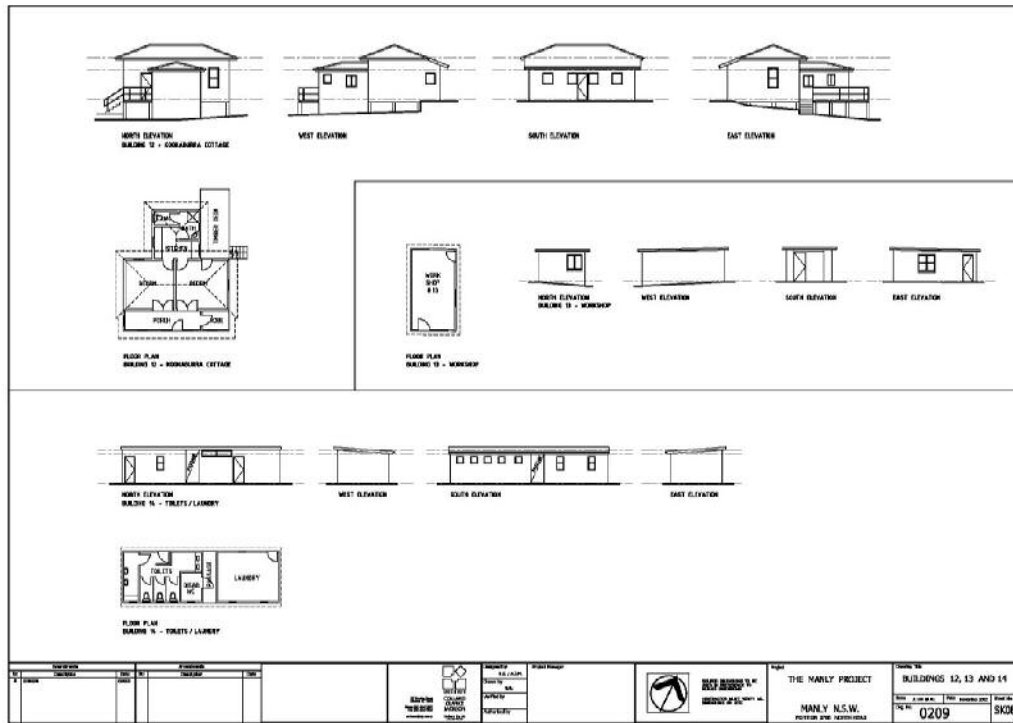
Drawing showing Kookaburra Cottage and the laundry/toilet block. Collard Clarke Jackson Architects - March 2003.
